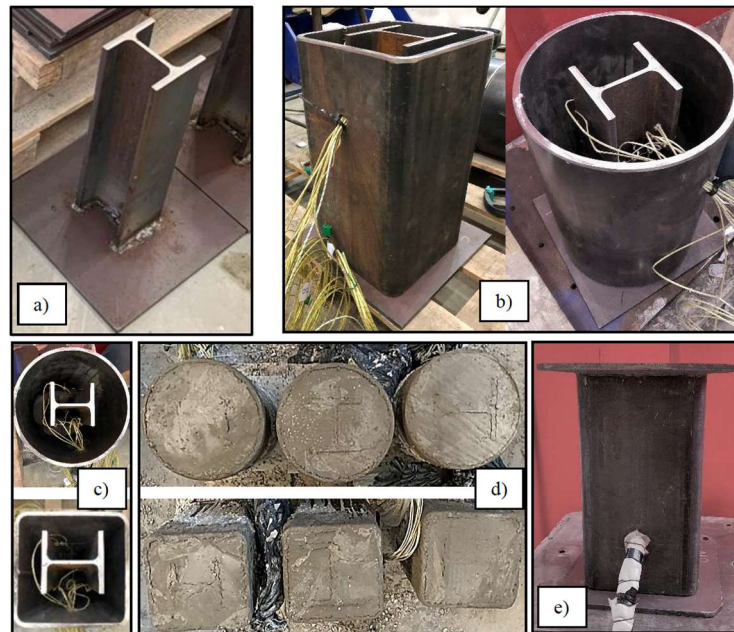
Columns preparation: a) Steel plate welded at bottom end of the embedded profile; b) Positioning of hollow steel tube; c) Positioning of thermocouples; d) Columns after casting; e) Column finished
